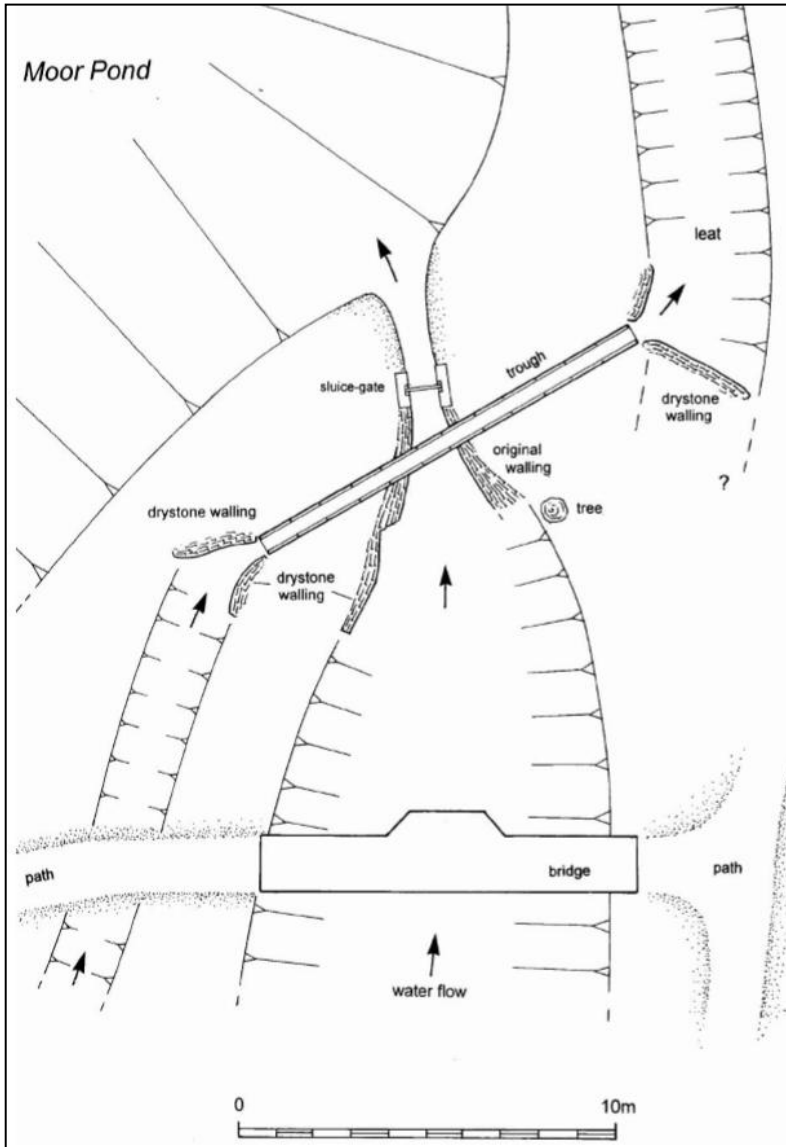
Plan of south sluice with trough or launder crossing over the stone wall approach to the gate. The plan does not show the full extent of the subsidiary pond on the left of the bridge, but it suggests the presence of dry stone walling in place to funnel the water from the pond into the trough and onto the leat. Looking south (From Sheppard, 2007)
